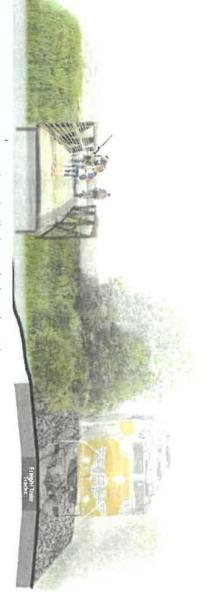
Trail concept as elevated boardwalk alongside the rail corridor
